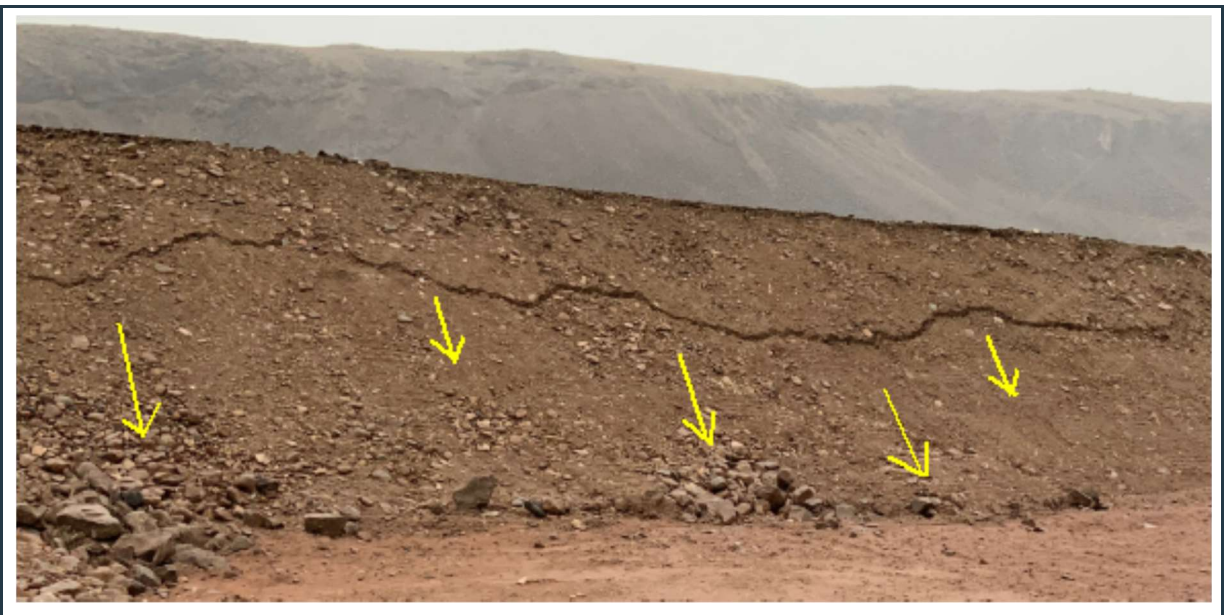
View of the face of the slope at KM 09+700. Note the slumping/spalling/raveling of material trickling/rolling down on sections of the face of the slope without endangering the traffic on the tote road, located well away from the slope.
